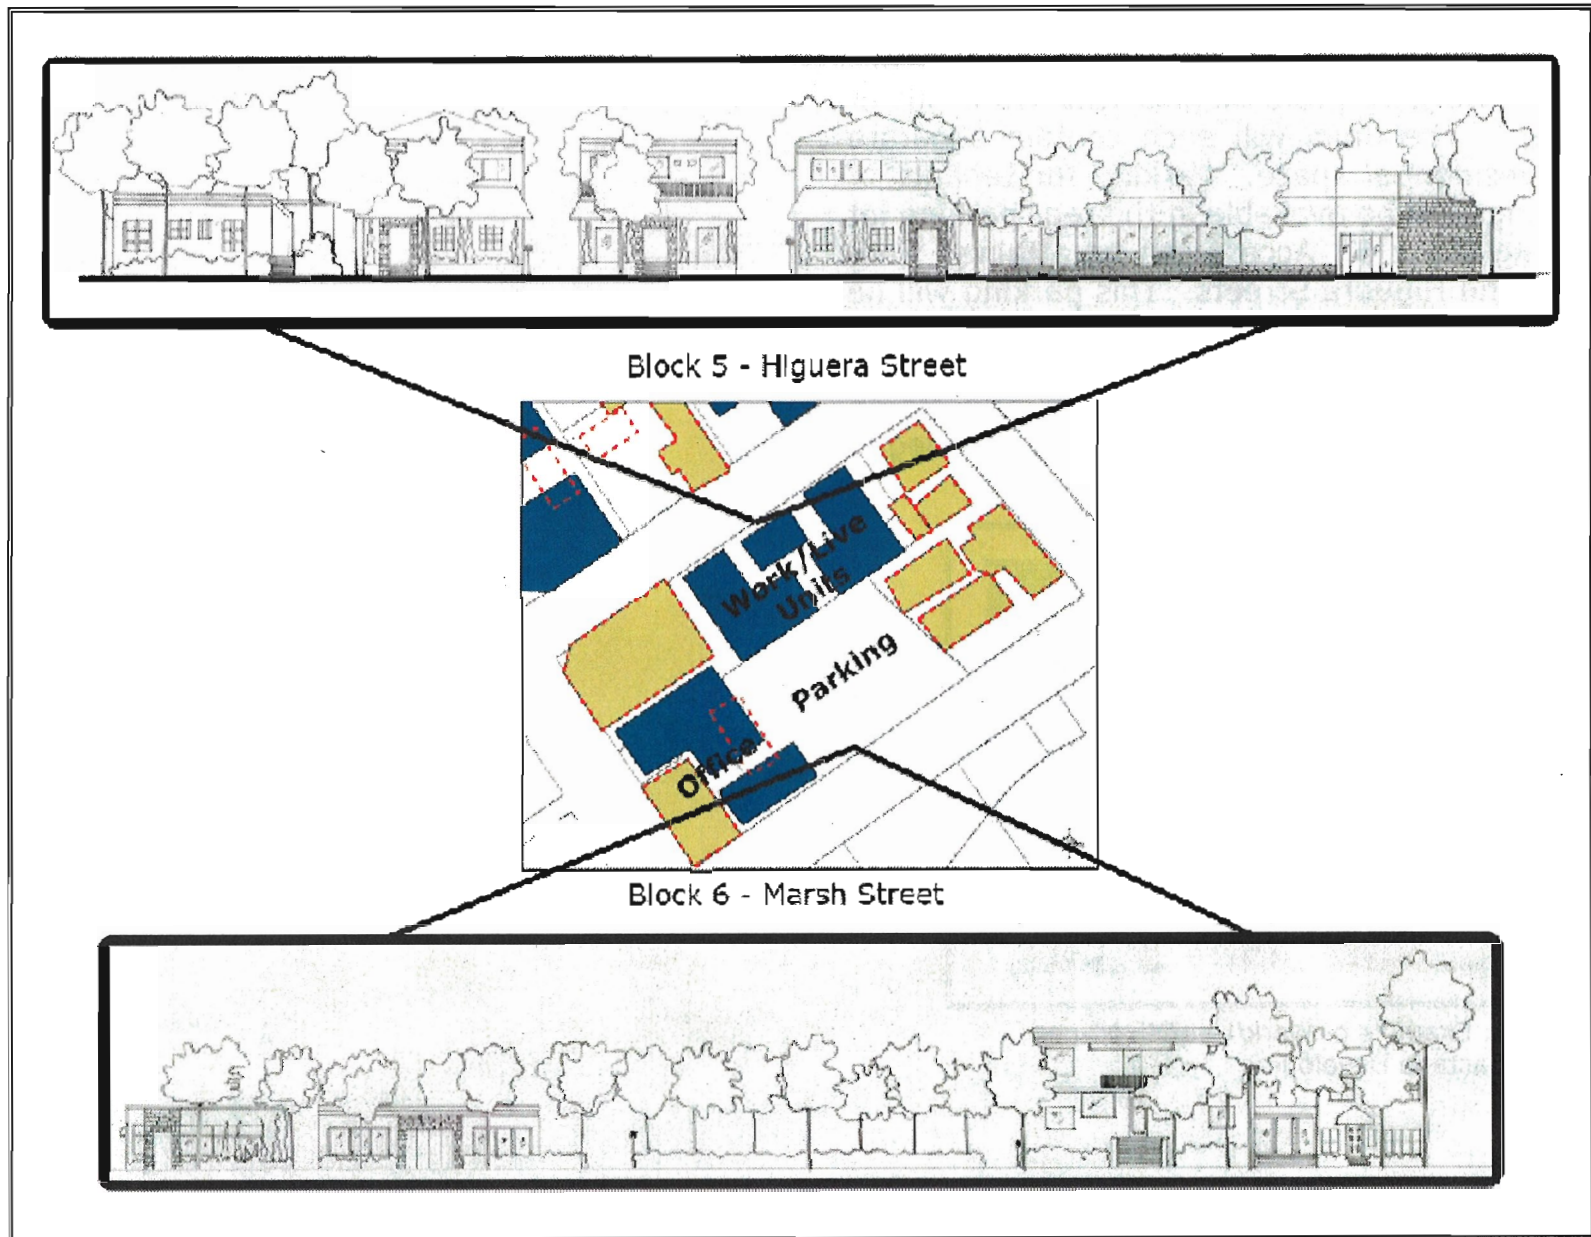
Proposed Site Plan and Street Elevations for Blocks 5 and 6
